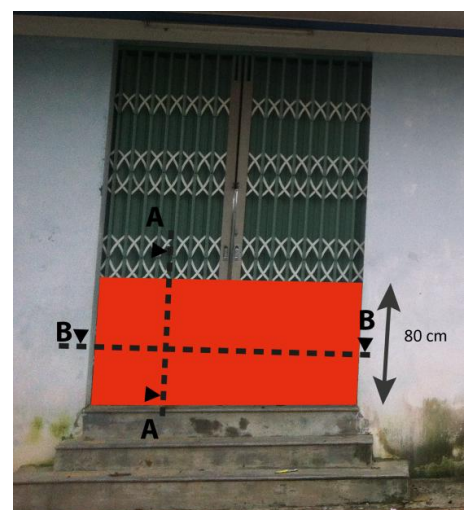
DOORWAY BARRIER WITH CROSS SECTION DIRECTION AA AND BB, FRONT VIEW
